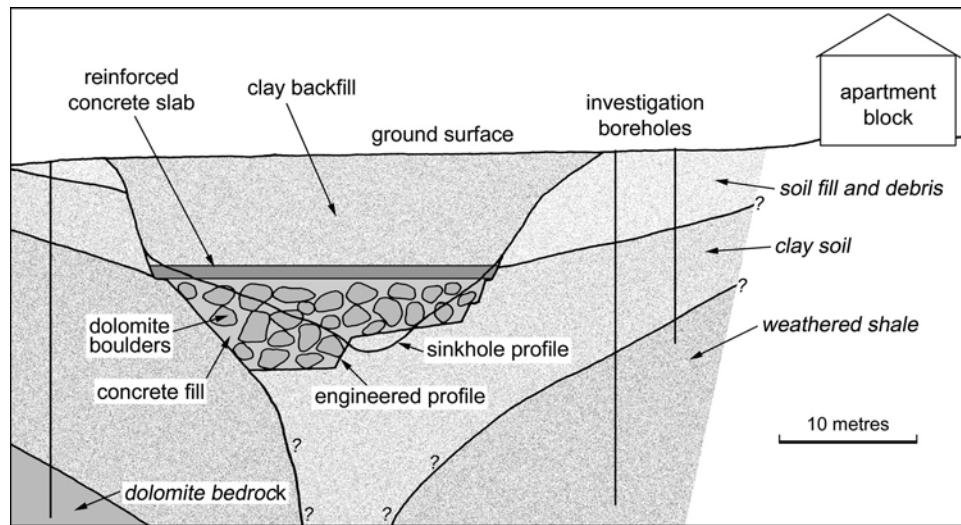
Cross-sectional view of the Macungie sinkhole showing its engineered repair and backfill [42]
